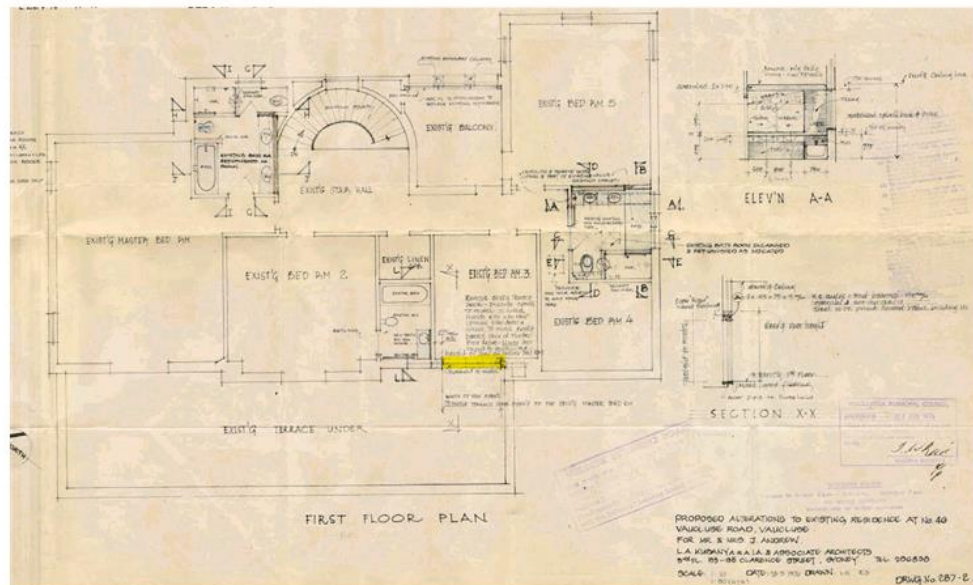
Kubany scheme first floor plan, with works not carried out shown highlighted.
